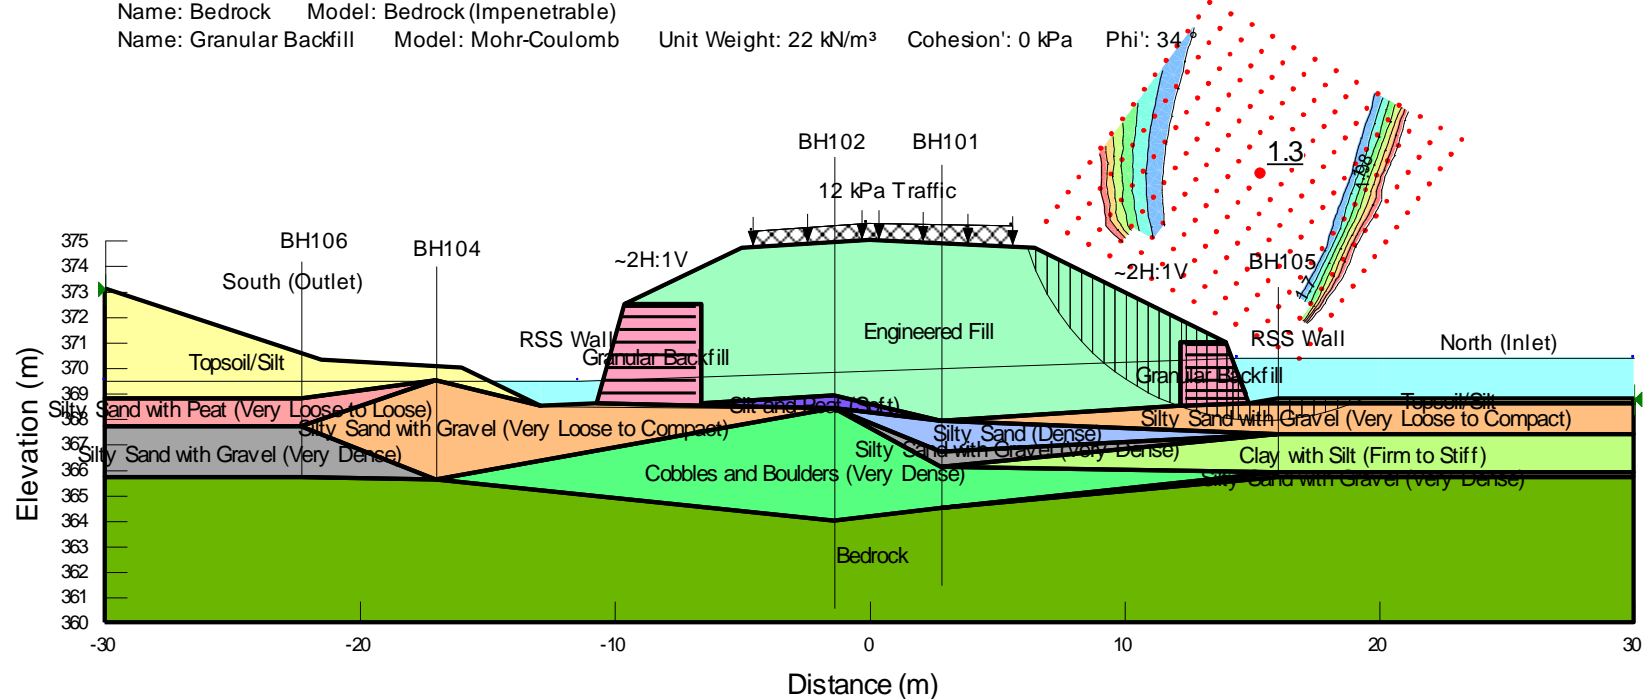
North side of embankment (inlet) with RSS wall – drained static condition
